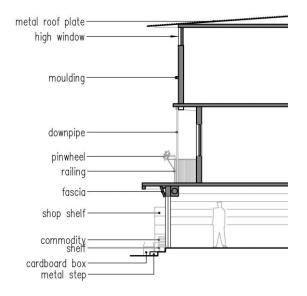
Section of Chow Yuk Kee Department Store 1:150 (Source: Drawn by the Author)
